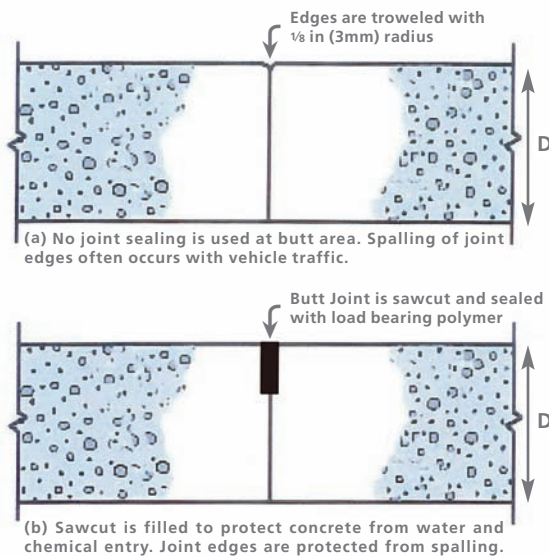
illustrates unreinforced construction joints. These joints are used to create "stopping points" in the concrete placement process. They can also be used as contraction joints. These types of joints require sealing.
